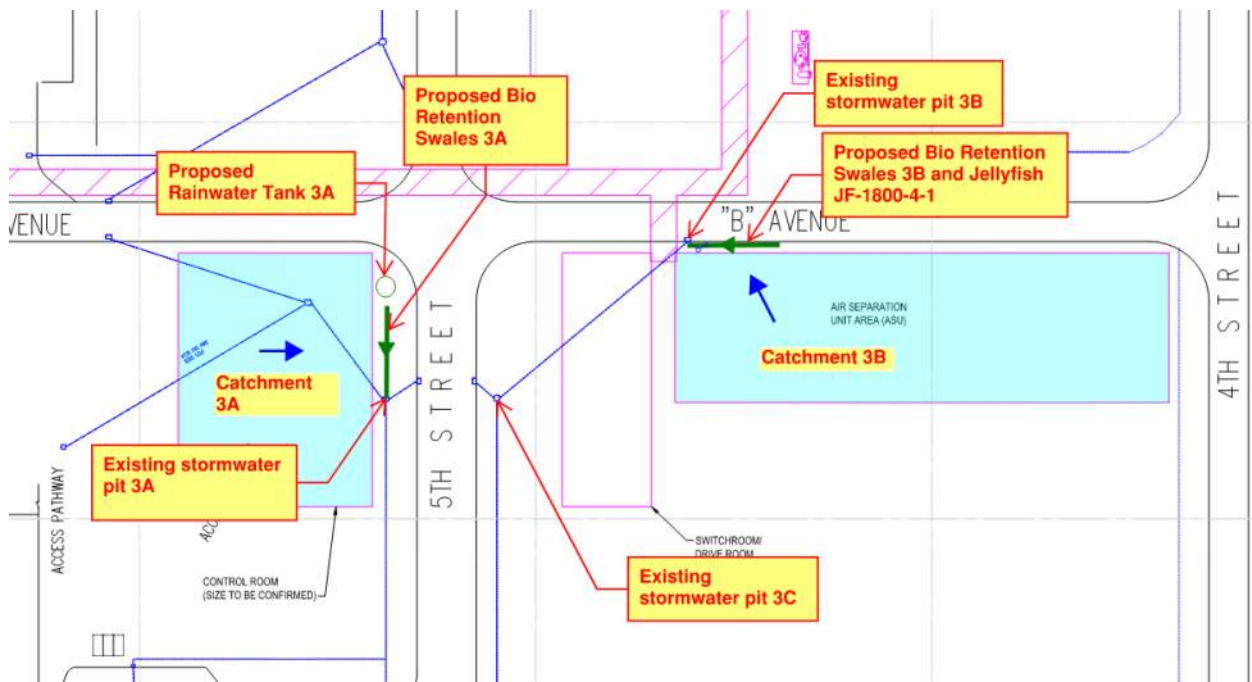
Proposed stormwater management for Area 3 (refer to Appendix C for a larger version of this plan)
